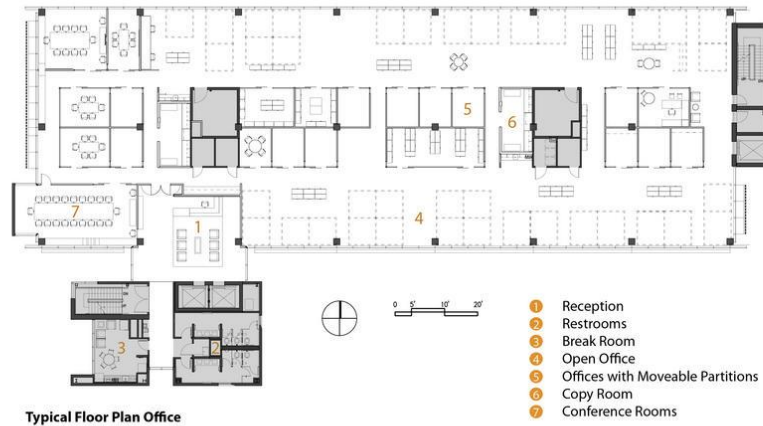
Typical Floor Plan Office (www.panoramio.com)
